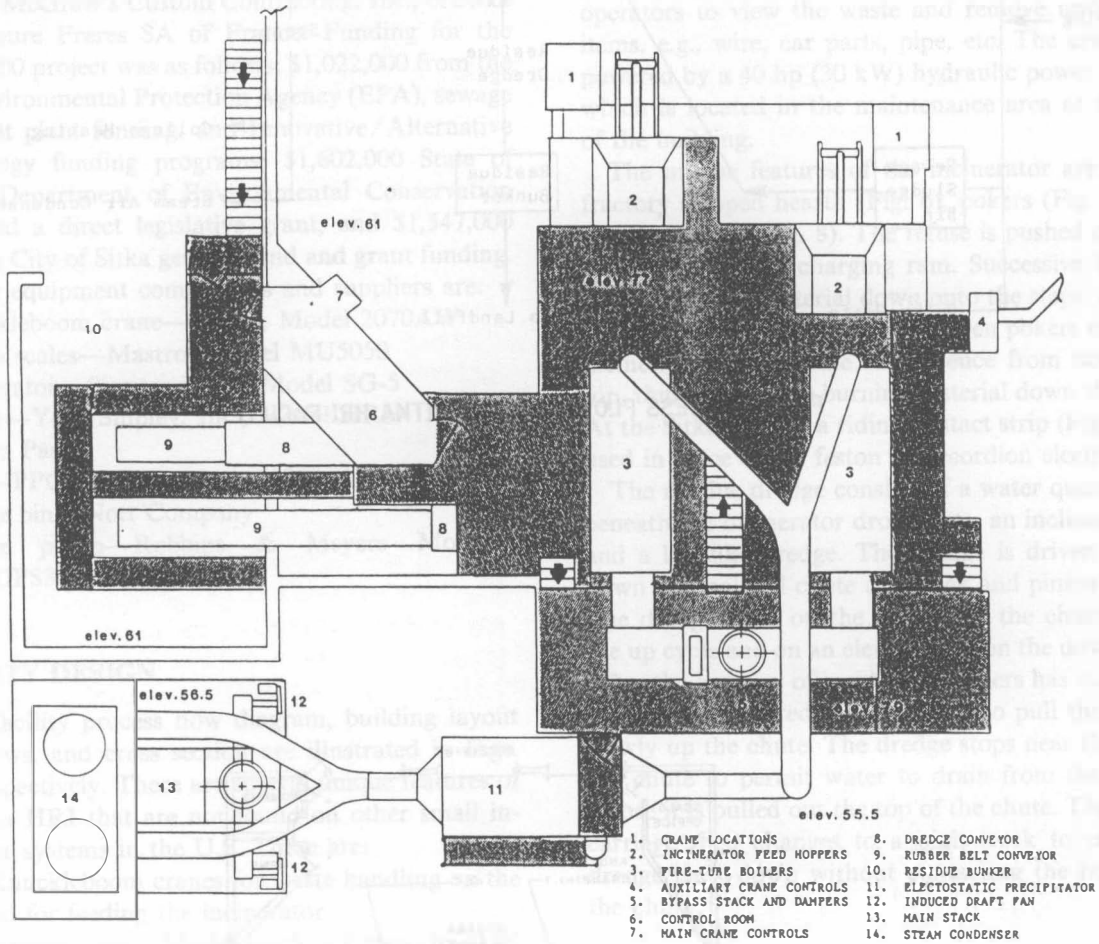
SITKA HRI FACILITY BUILDING LAYOUT
